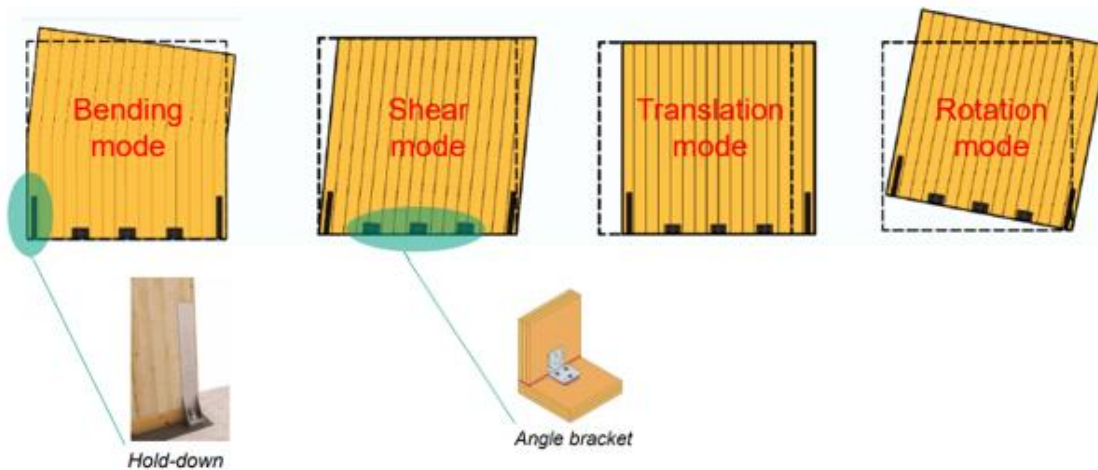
Separate deformation modes of the total horizontal load deformation of the CLT shear-wall (Bjørnfot, 30.Okt.2018)
